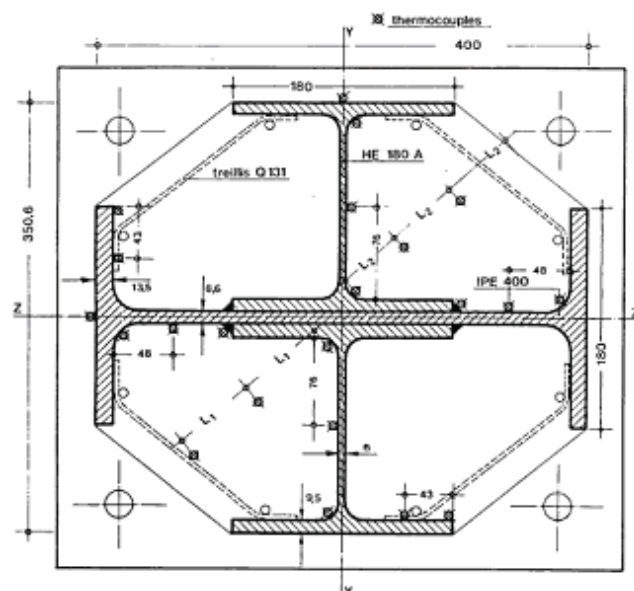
Cross-section of the composite column tested under ISO fire (REFAO, 1987)
